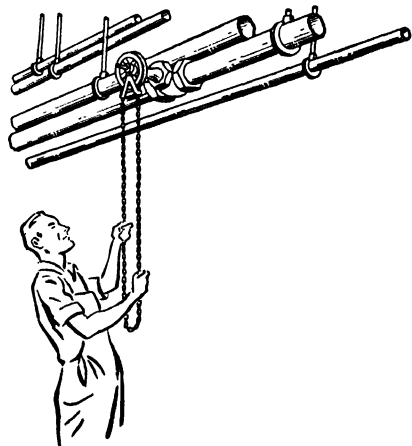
Install a pull chain on overhead valves. (Courtesy of Crane Co.)
